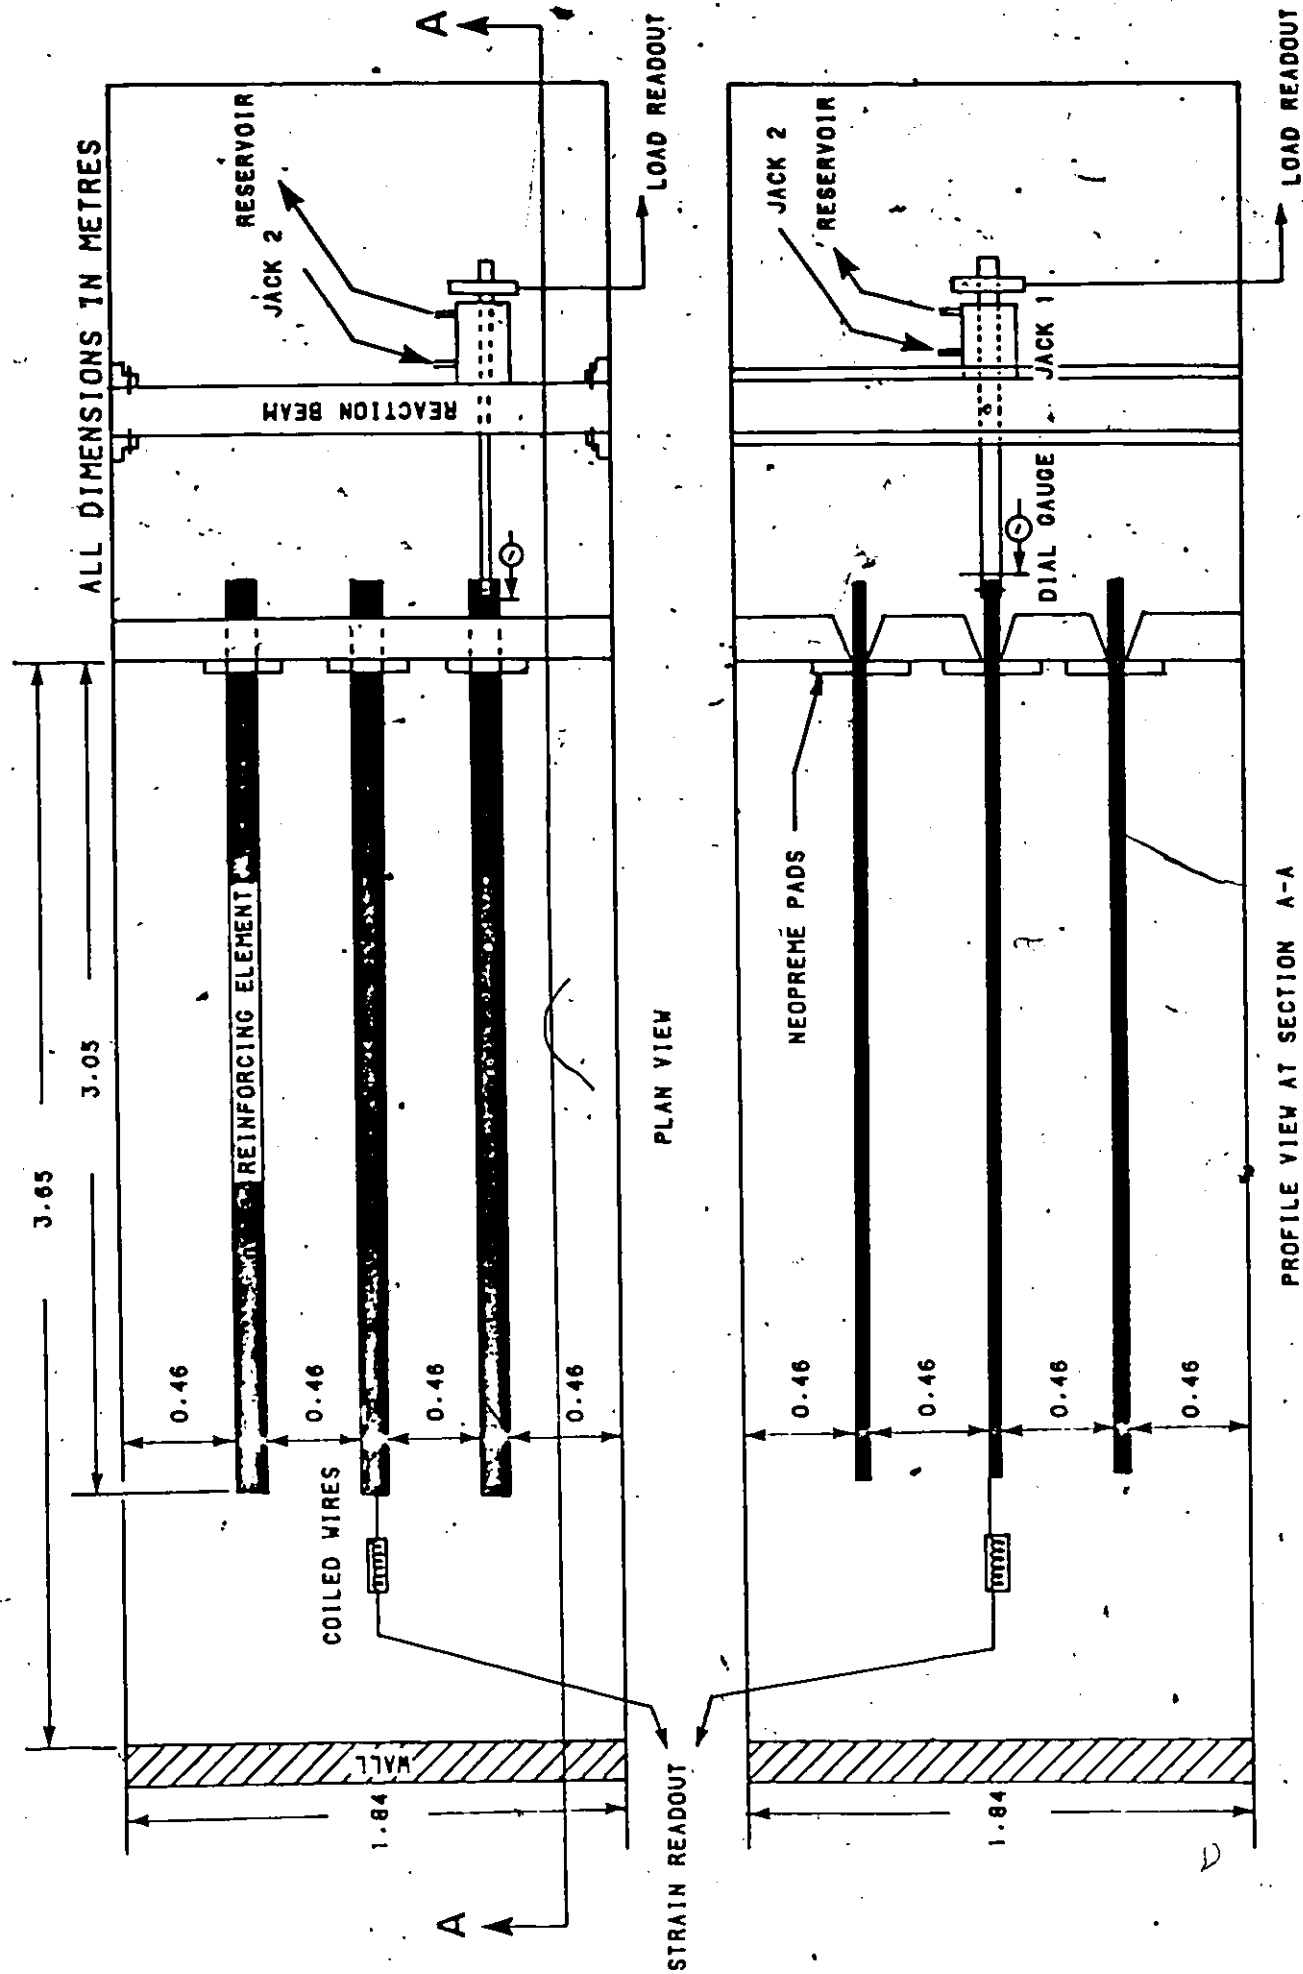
SCHEMATIC VIEW OF PULLOUT TEST
